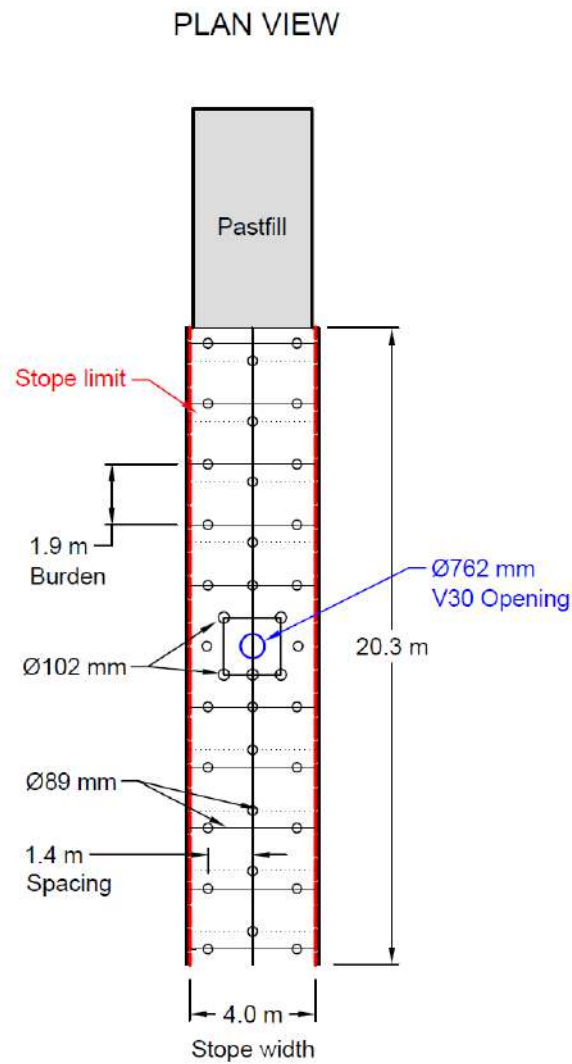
Typical drilling pattern - Valley Zone – Plan view
